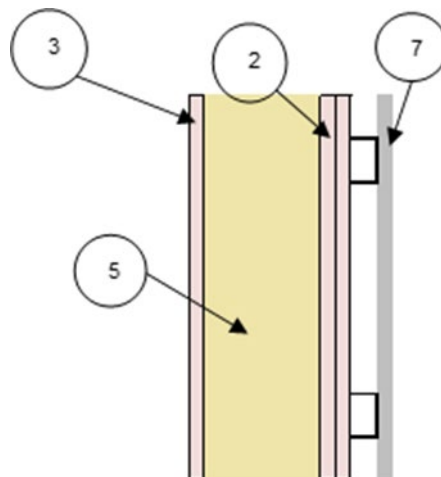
Massive timber wall system with non-fire grade cladding – Section view
